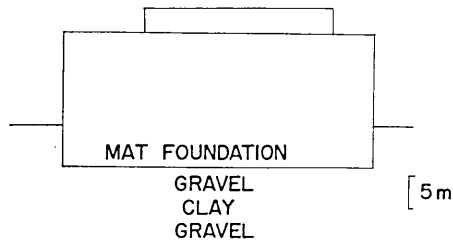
Foundation and soil condition of the Shizuoka Administration Building.
